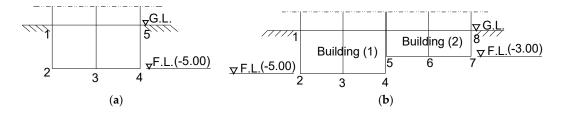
Points distributed around the foundations of the single building and the two adjacent buildings with unequal foundation levels. (a) Single building basement foundation; (b) The foundations with unequal levels of the two adjacent buildings.
